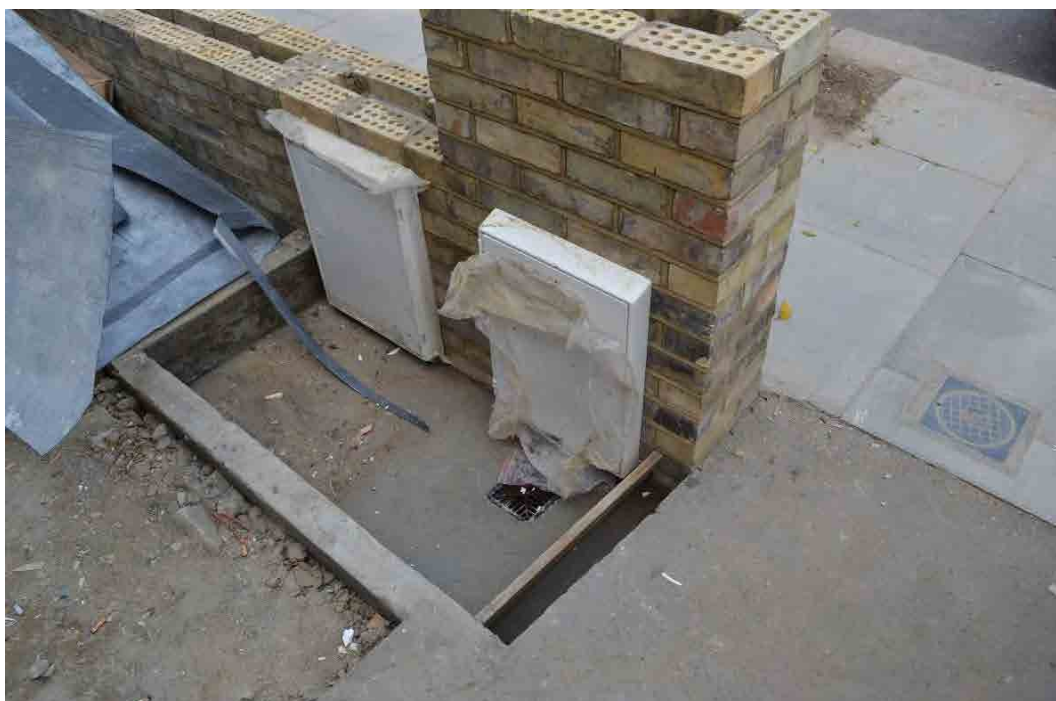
Front wall and recess for planters under construction in 2015, showing drainage gully in base of recess.
